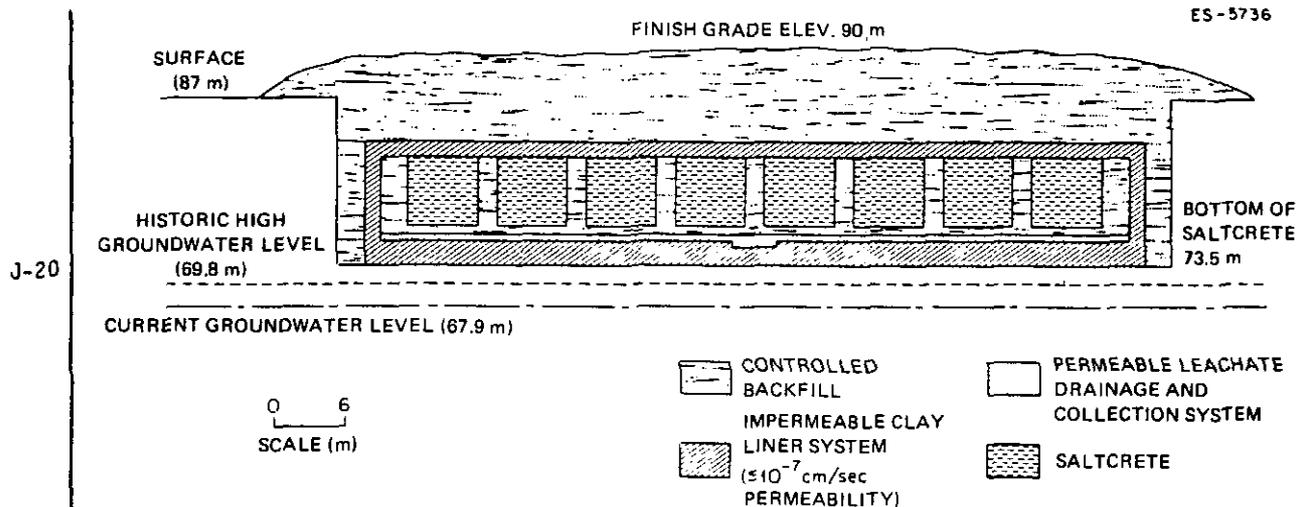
Typical vertical section, engineered landfill for burial of saltcrete.
